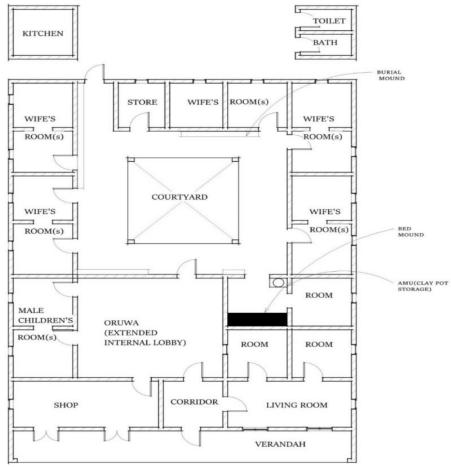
Plan of Awotiku House, Ile-Oluji.
